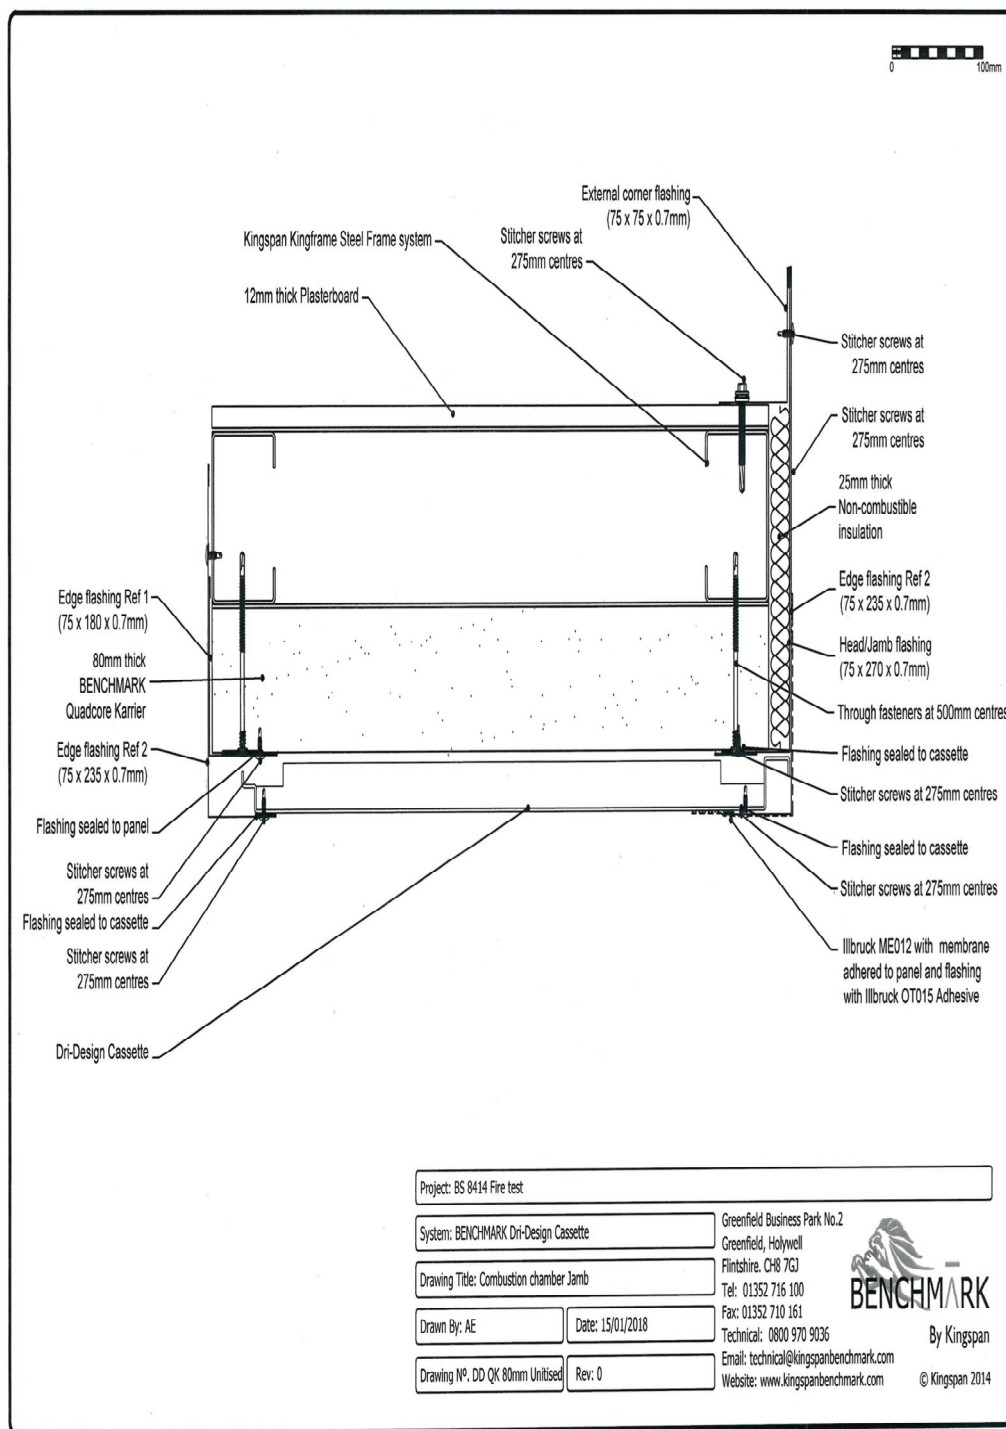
Client supplied drawing -Combustion chamber jamb detail
